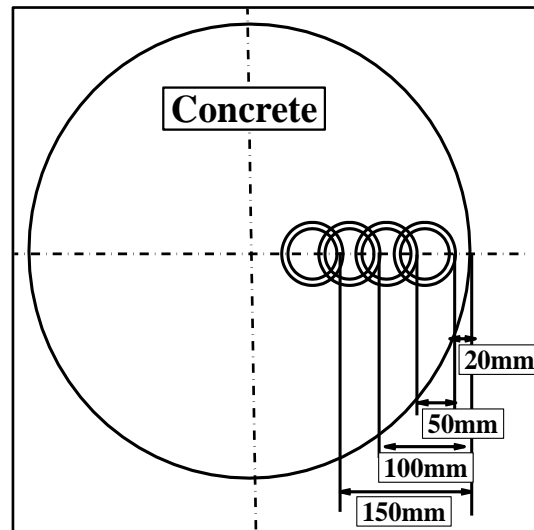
2. Geometric dimensions of the spacing between the pipe and the concrete wall.
